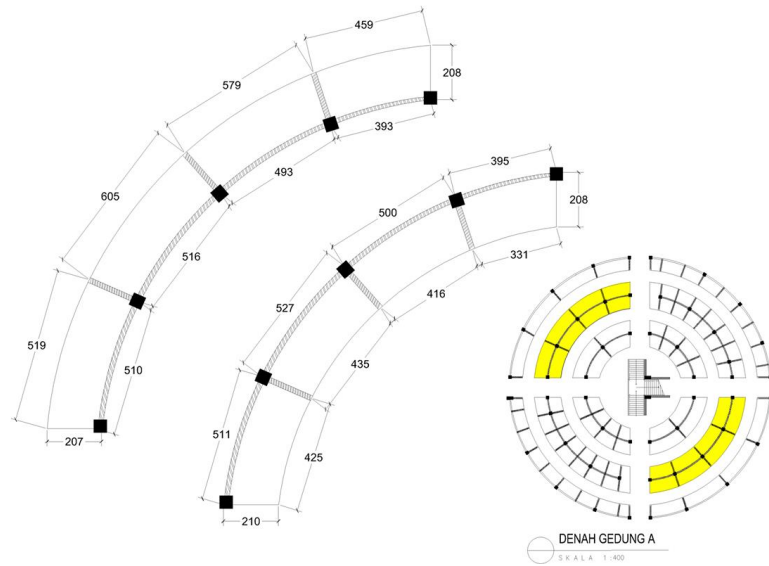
Two-Faced Four-Row Kiosk Layout Block 2 (Building A) (source: author)
